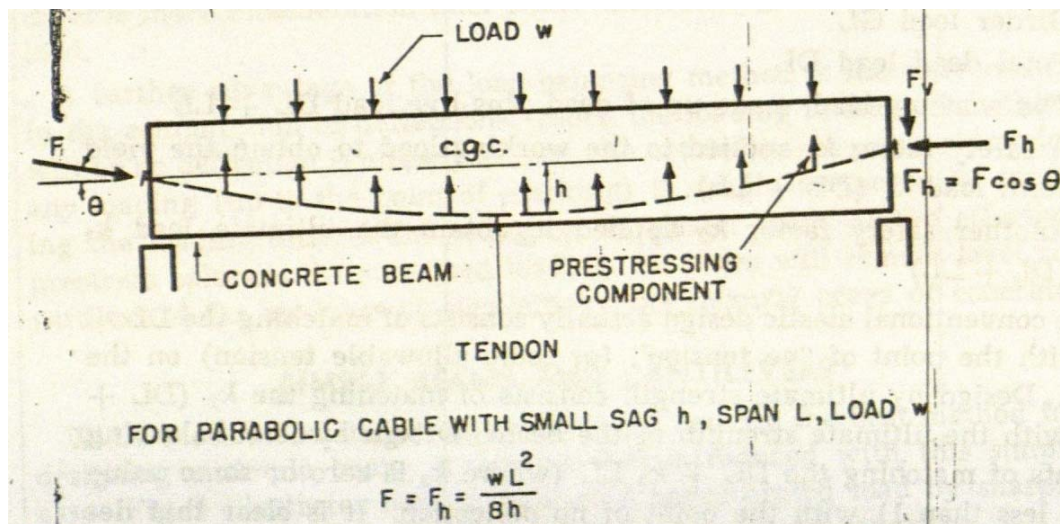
Load balancing design of prestressed concrete (Lin 1963)
